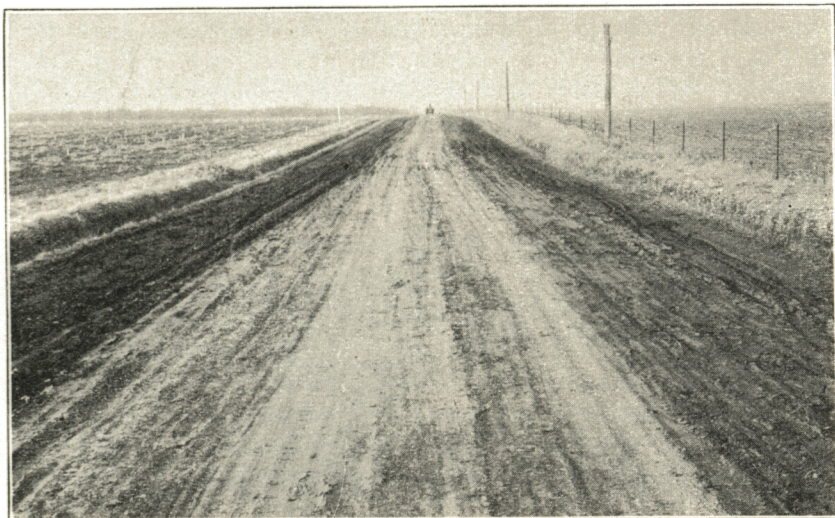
SECTION OF RACE-STREET ROAD, MARCH 4, 1924
